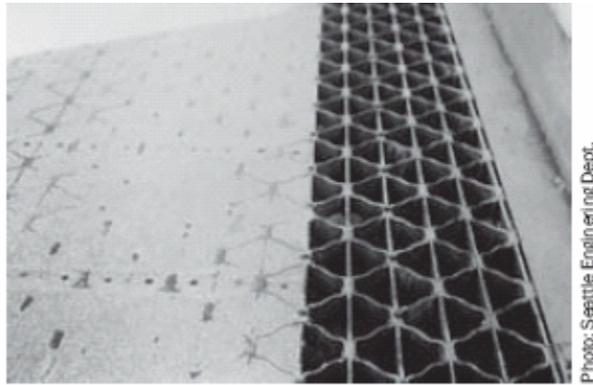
Example of shoulder treatment on bridge with steel grate.
